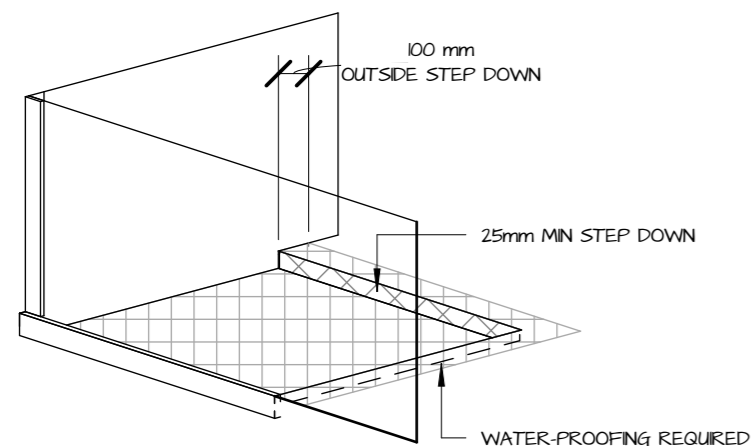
DETAILS ARE A GUIDE ONLY. ALL WATERPROOFING AND INSTALLATION SHOULD BE IN ACCORDANCE WITH AS3740
